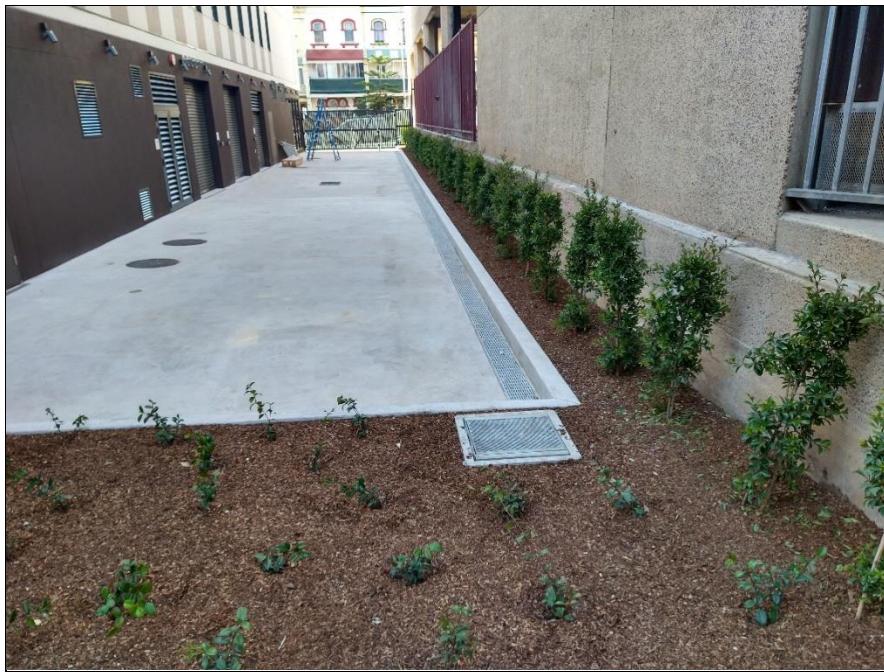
Looking north at concrete driveway and adjacent garden bed along the eastern site boundary (20 August 2021). Student Accommodation Building to the left and the Newcastle Police Station to the right.
